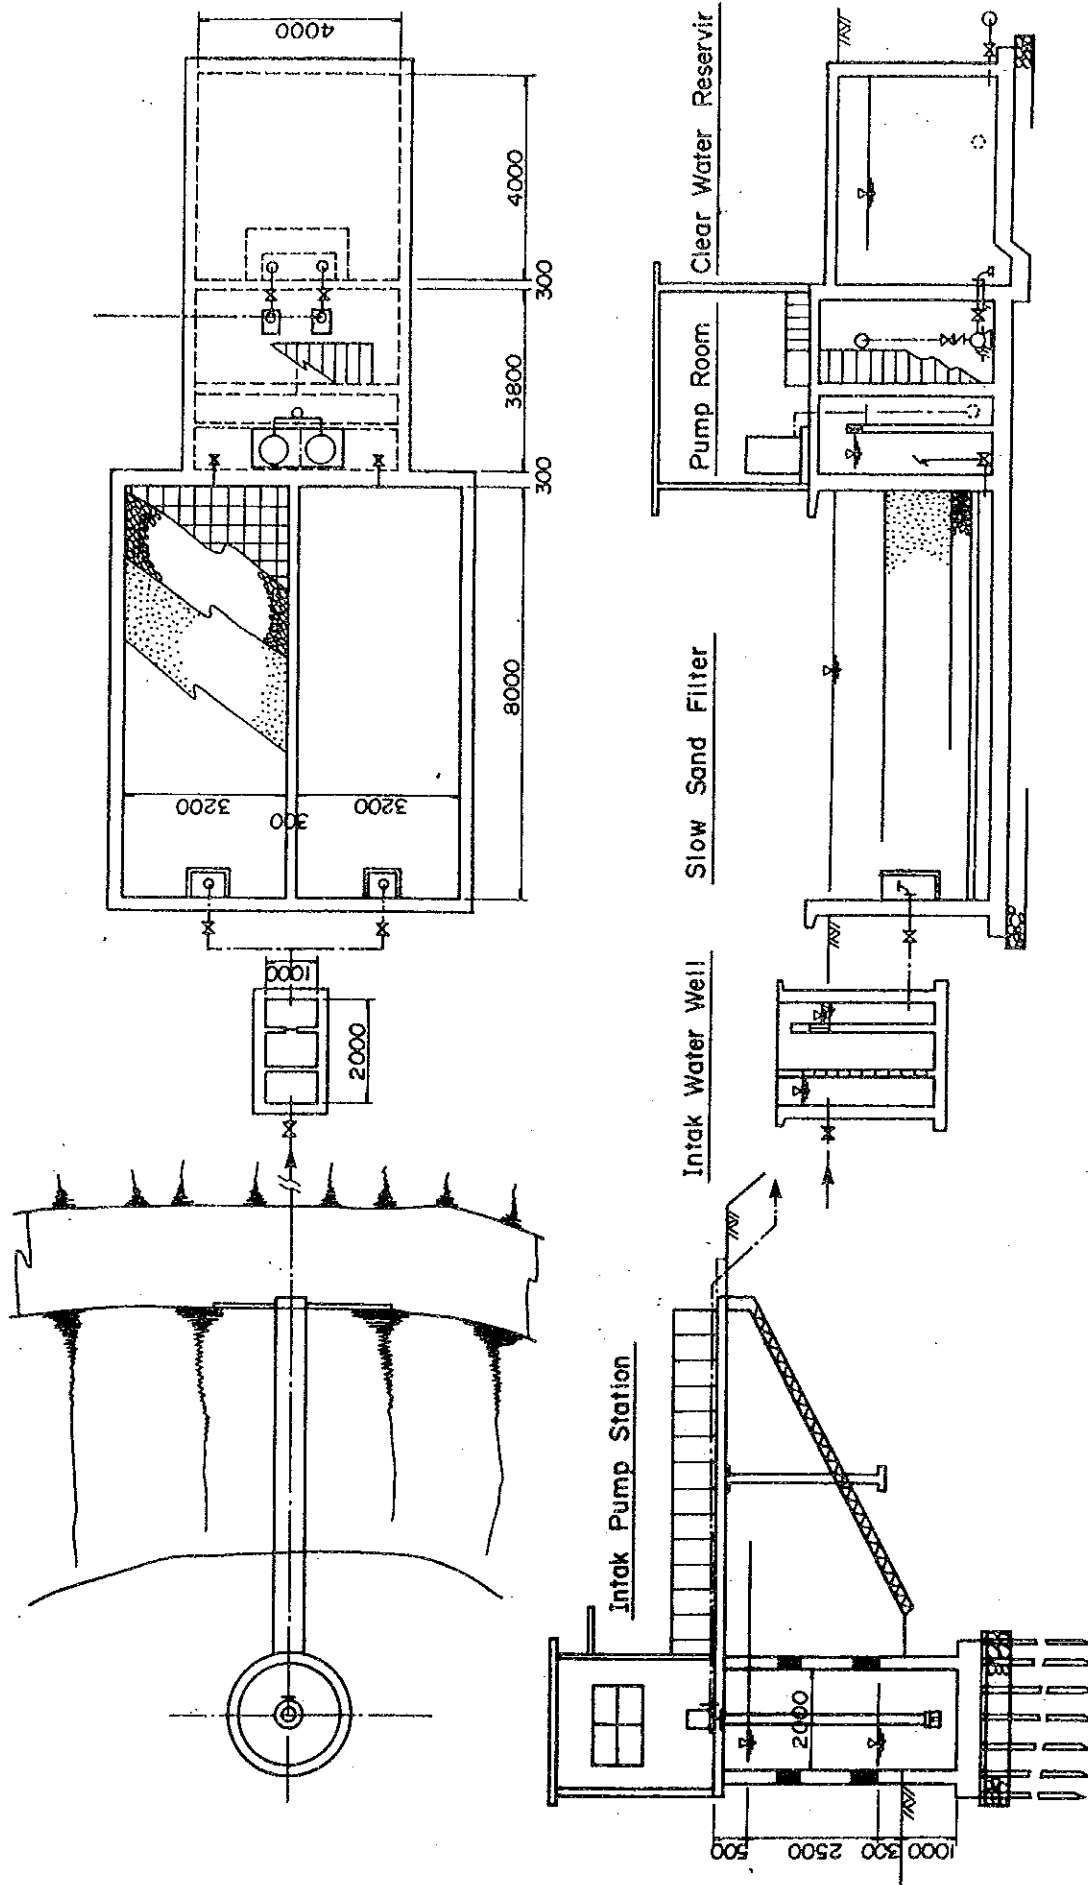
Las Aguitas Water Treatment Plant
